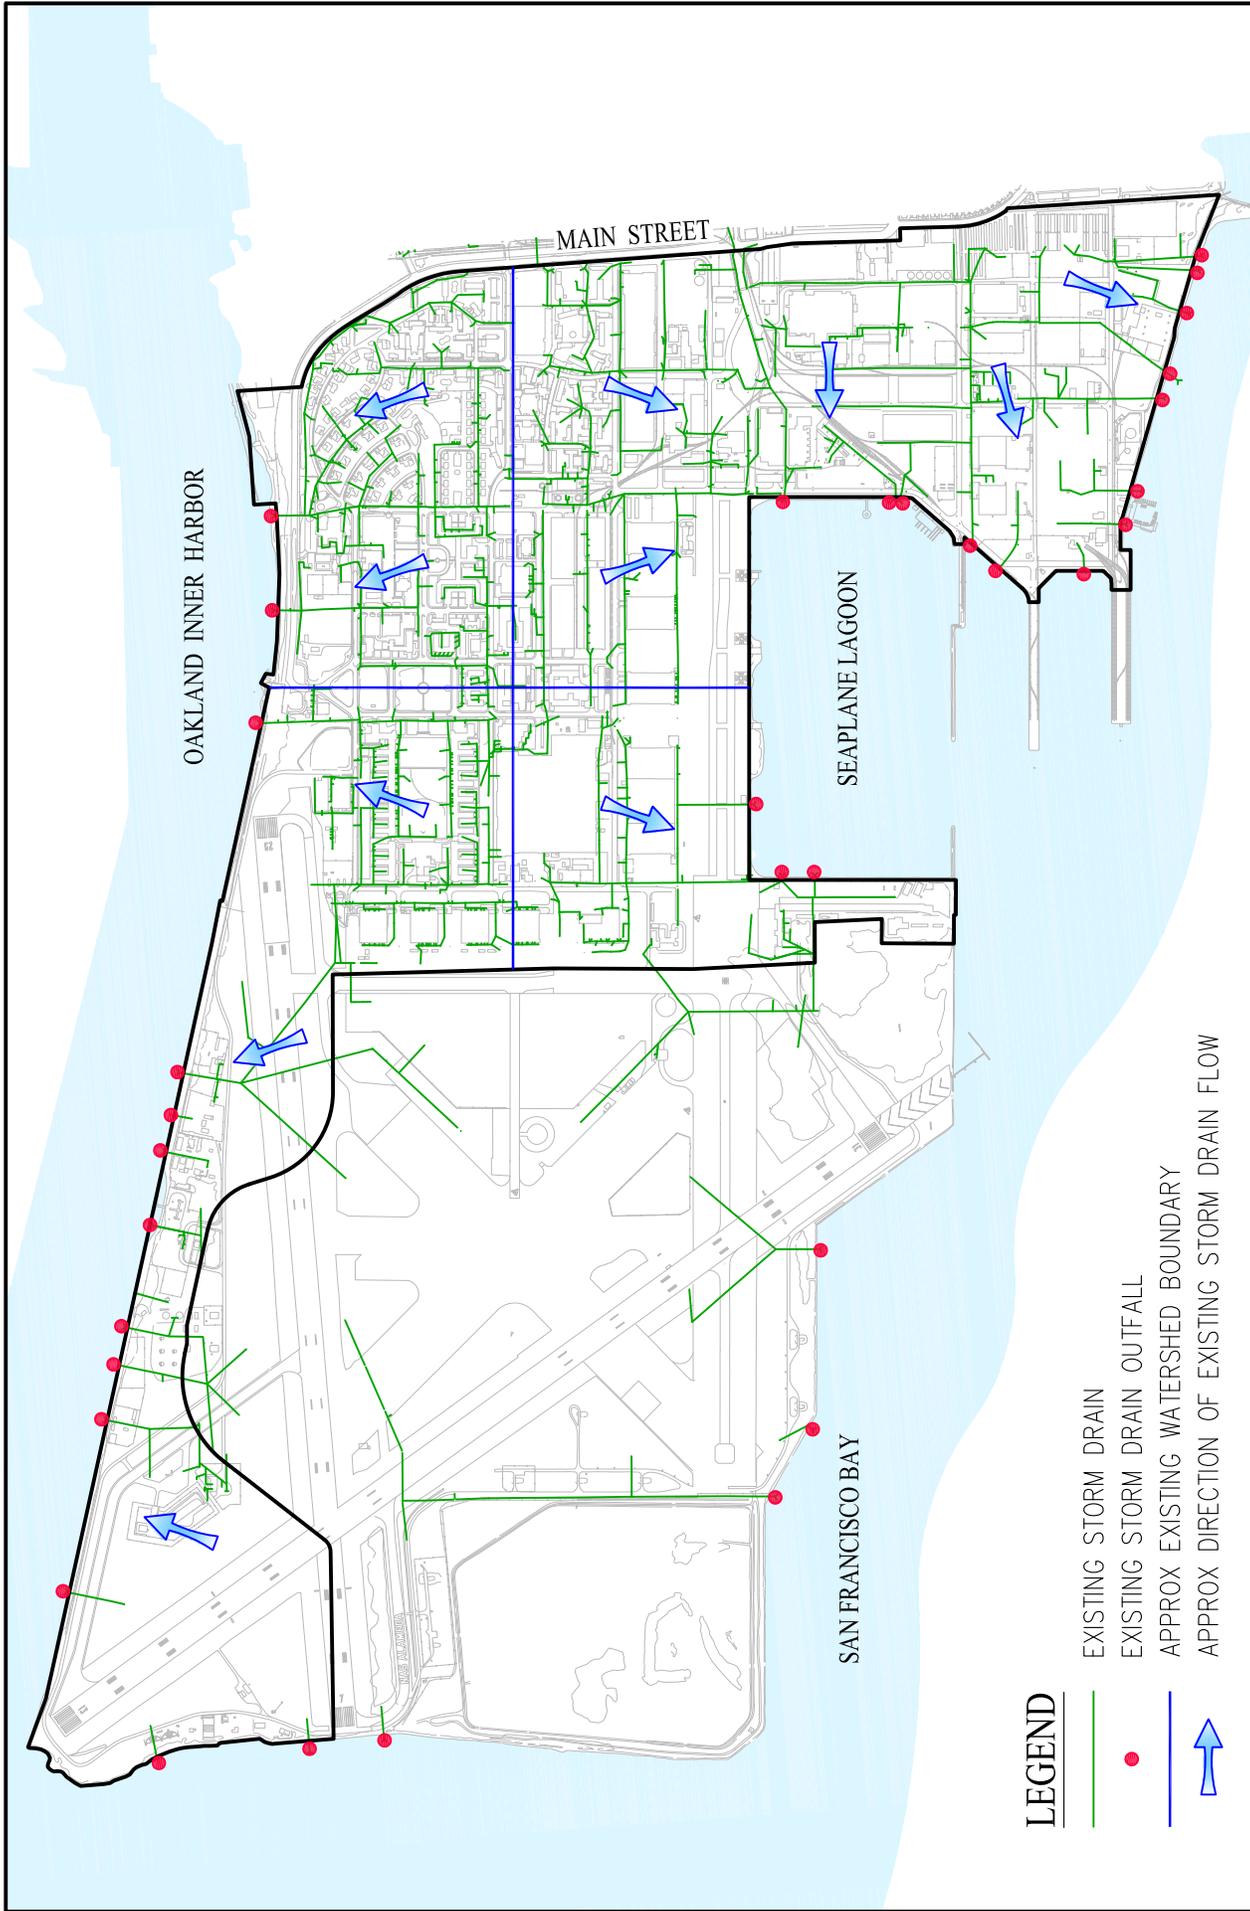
EXISTING STORM DRAIN & OUTFALLS
